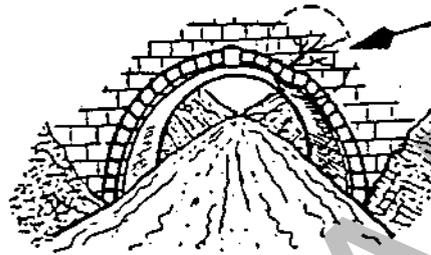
Loss of Shape and Cracking of the Arch Barrel
